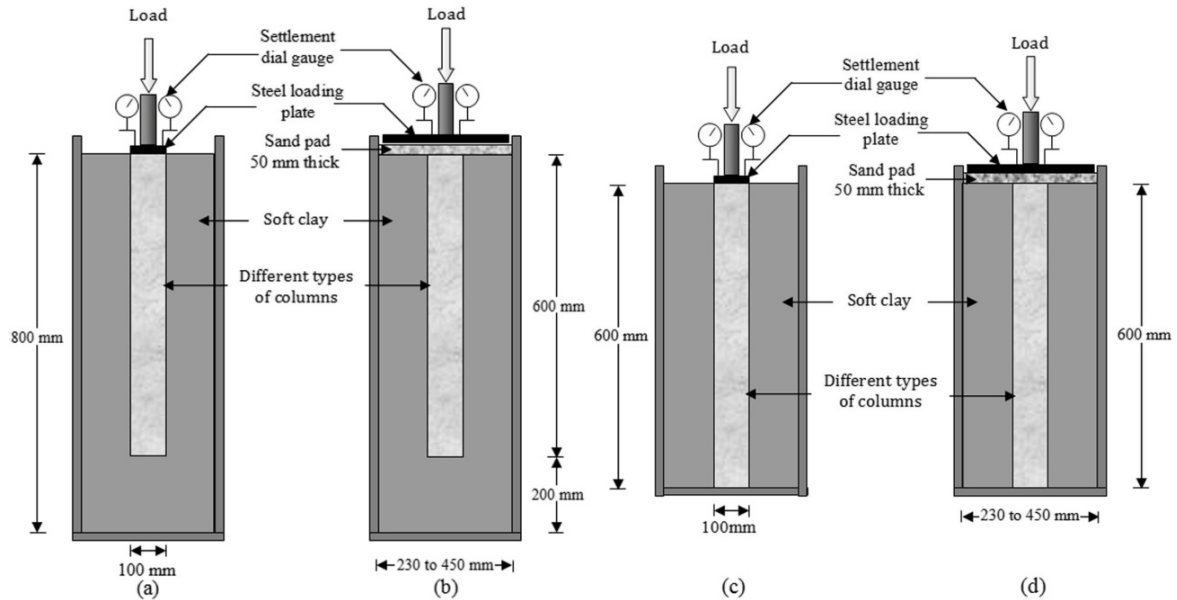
Test setups: (a) floating column with column area loading; (b) floating column with entire area loading; (c) end bearing column with column area loading; and (d) end bearing column with entire area loading
